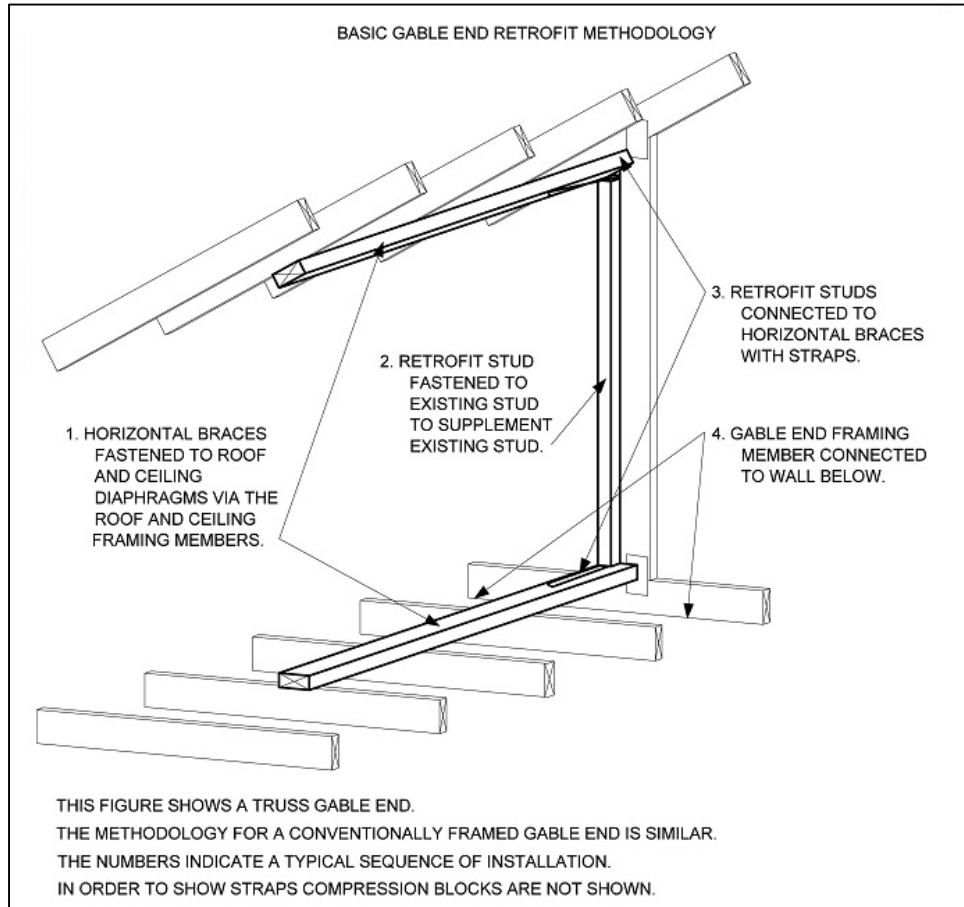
Gable-End Retrofit Detail from 2010 Florida Building Code (ICC 2011)
